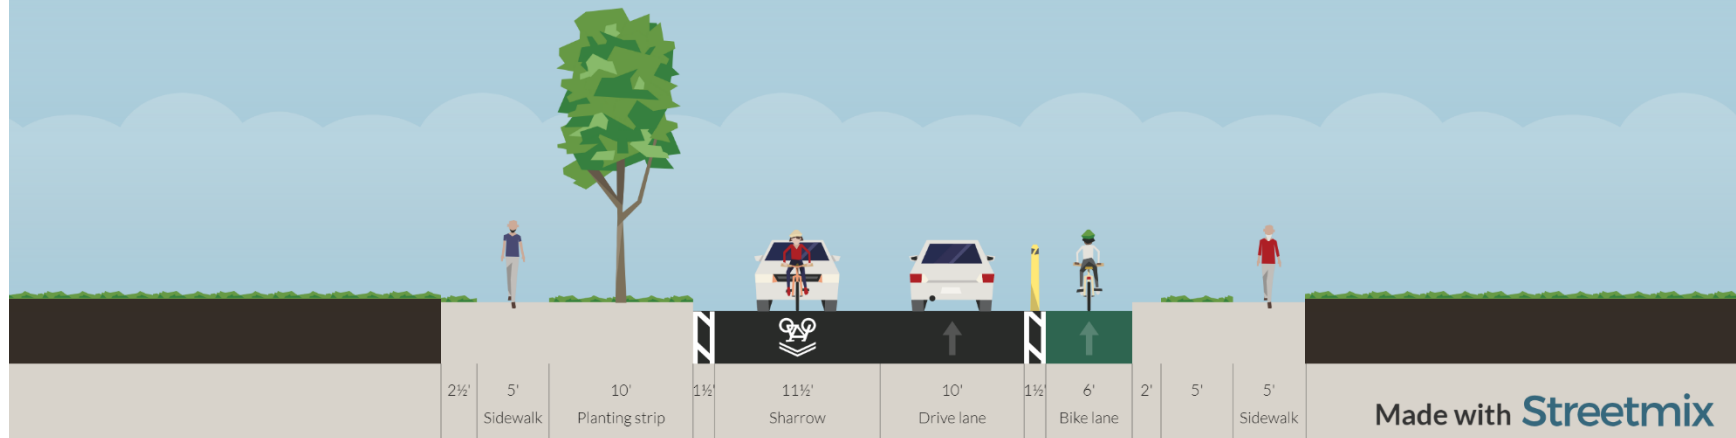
Tree Bulbout Segment (Proposed Typical Section)
